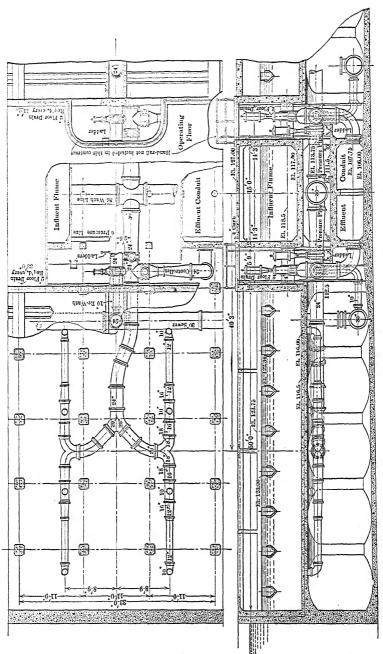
Plan and cross-section of filter piping and pipe gallery in St. Louis filter plant.
